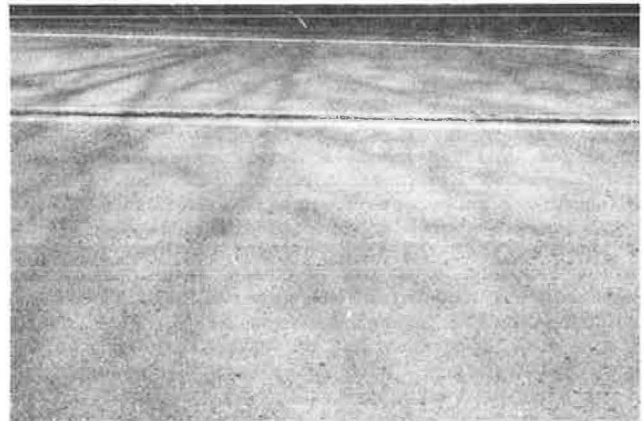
Asphalt T-5 showing well-defined full- and half-width transverse cracks.
